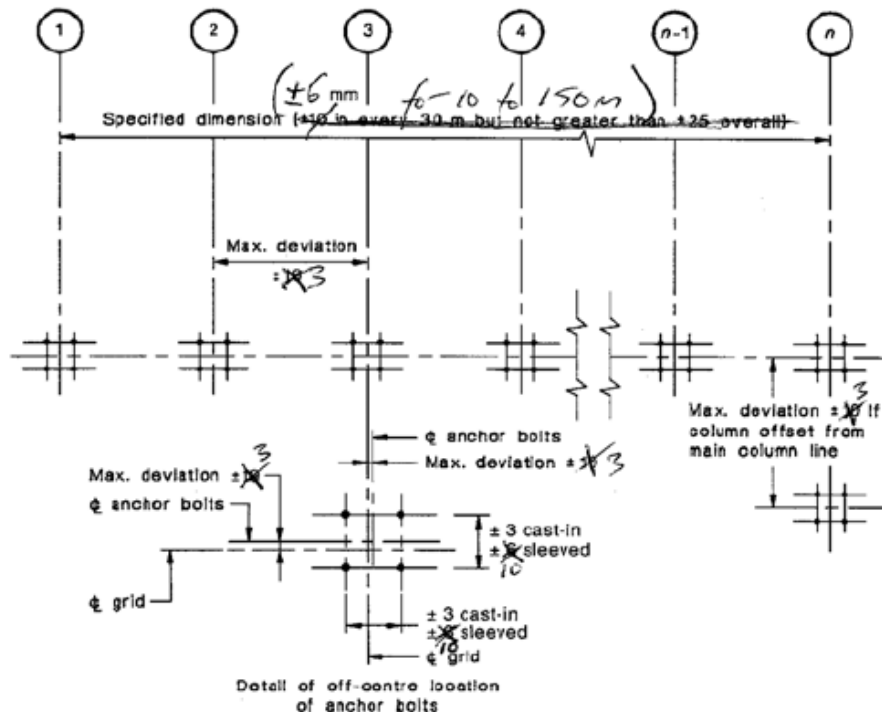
Holding Down Bolt Setting Out Tolerances Preferences
